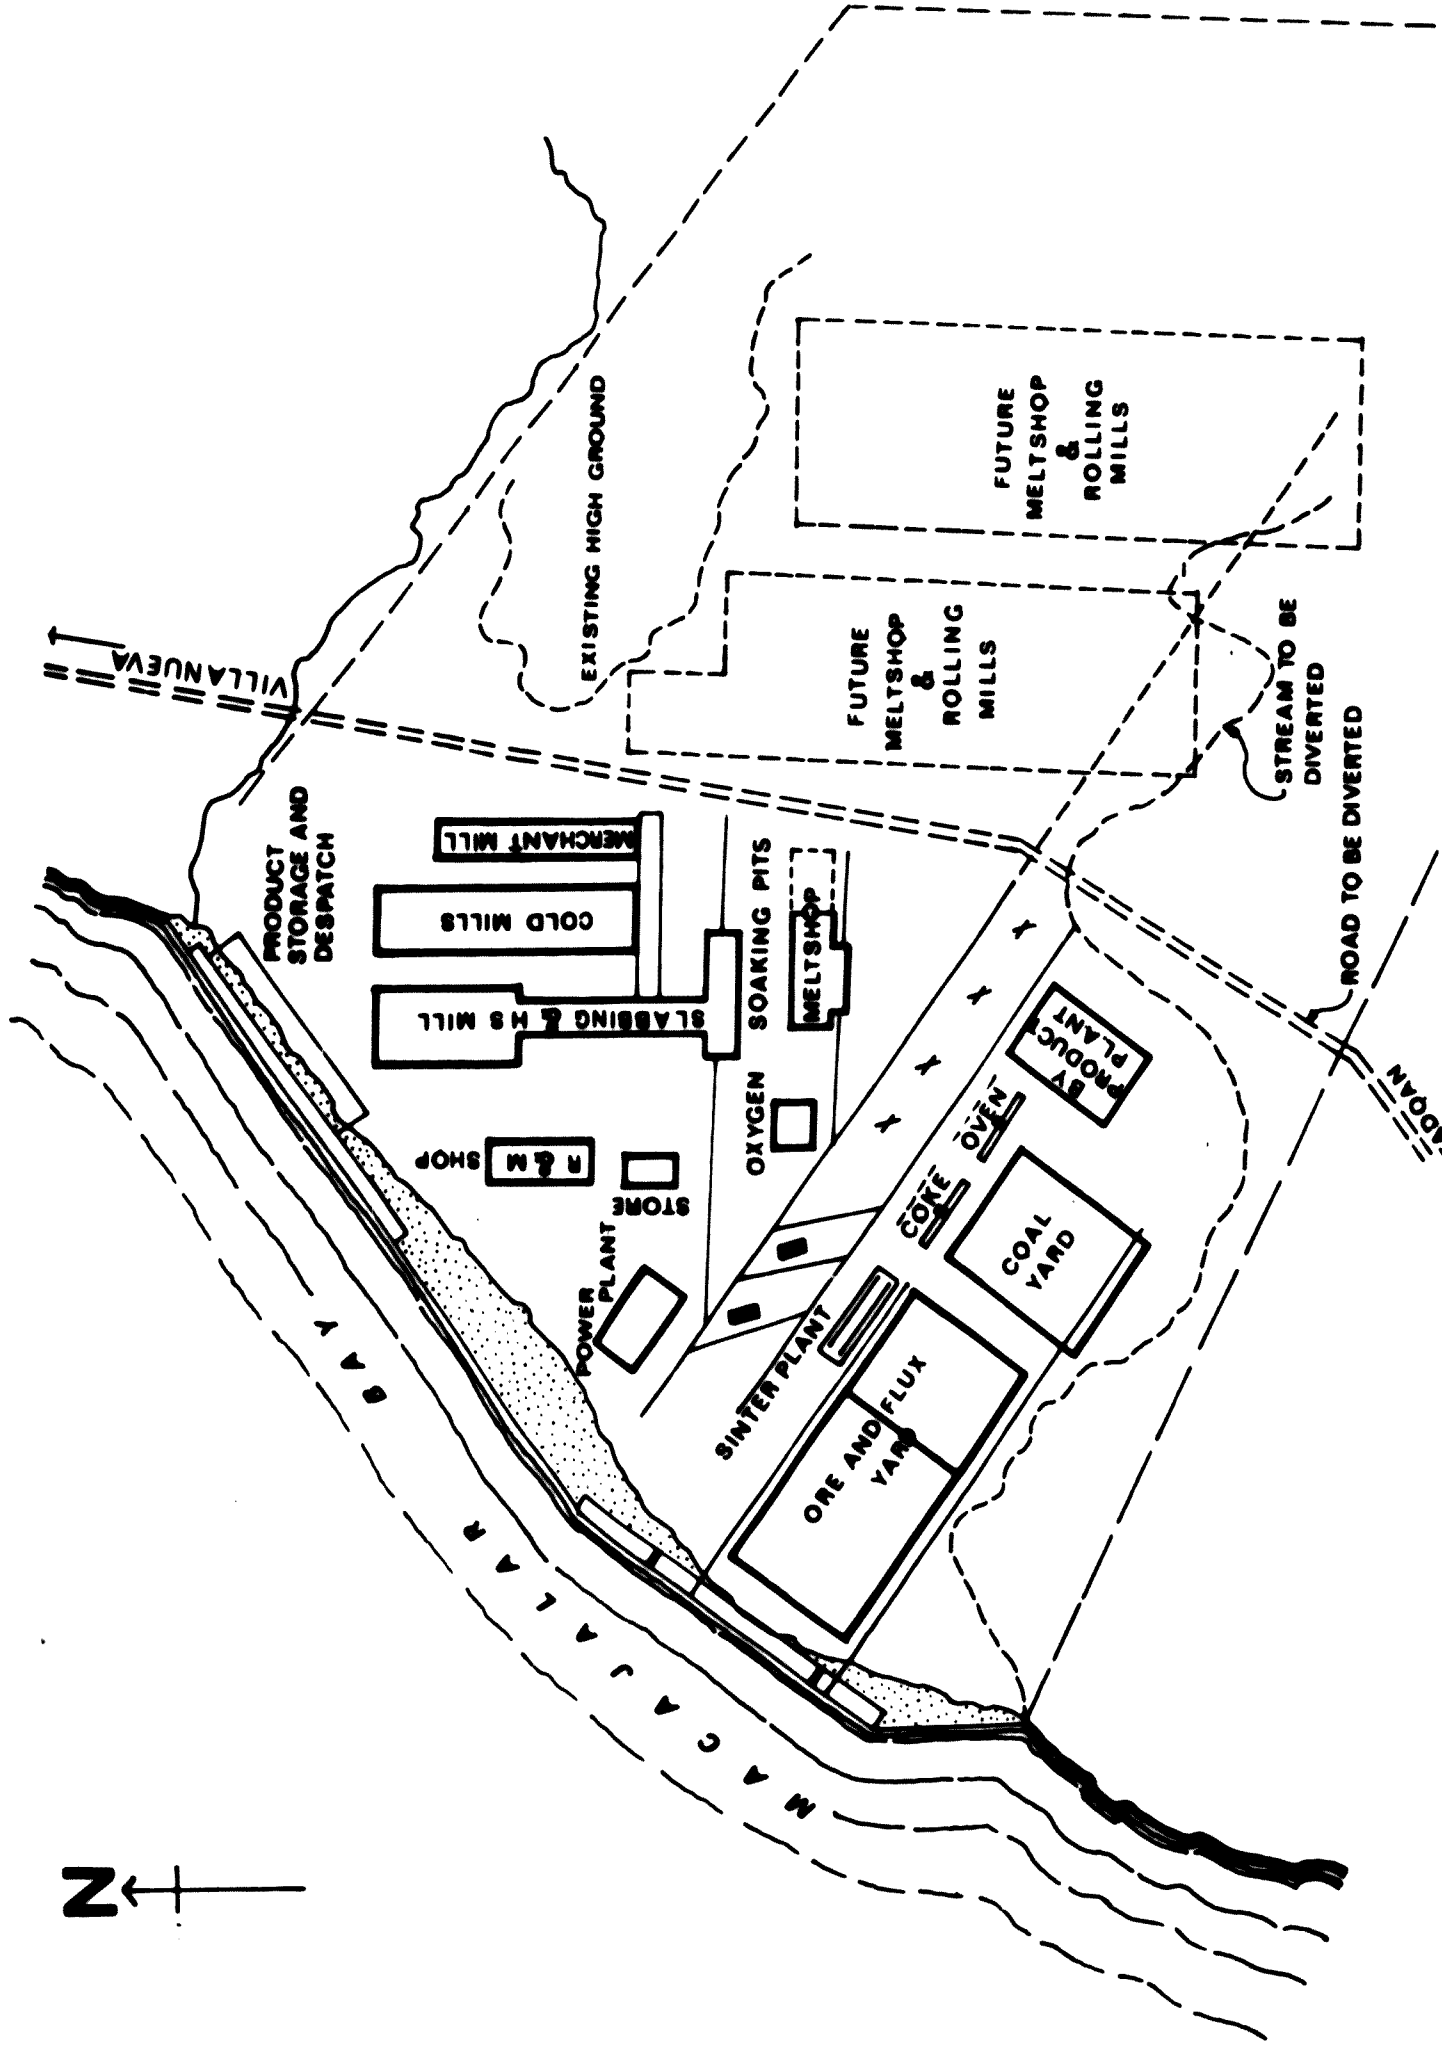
SUGGESTED LAYOUT FOR STEELWORKS - TAGLOAN
